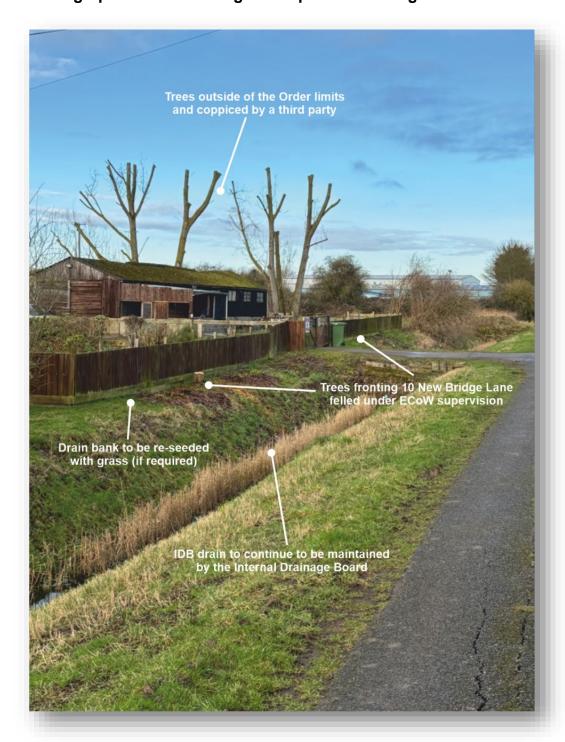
Photograph of 10 New Bridge Lane post tree felling
